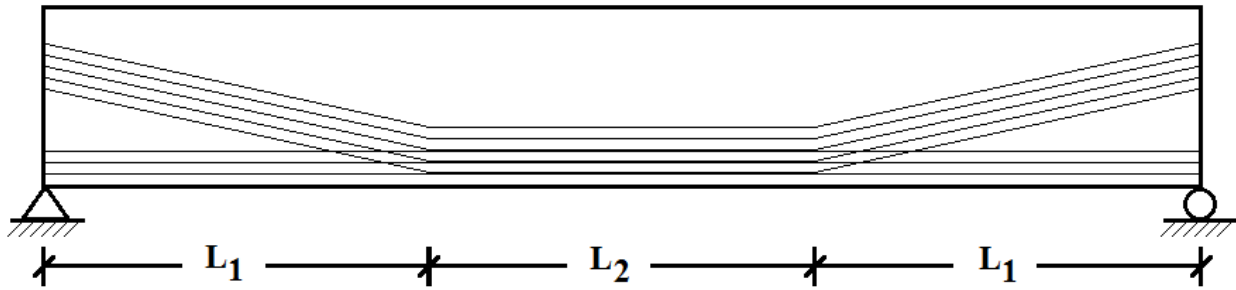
Sketch of Approximate Draped Strand Layout in ALDOT Girders
